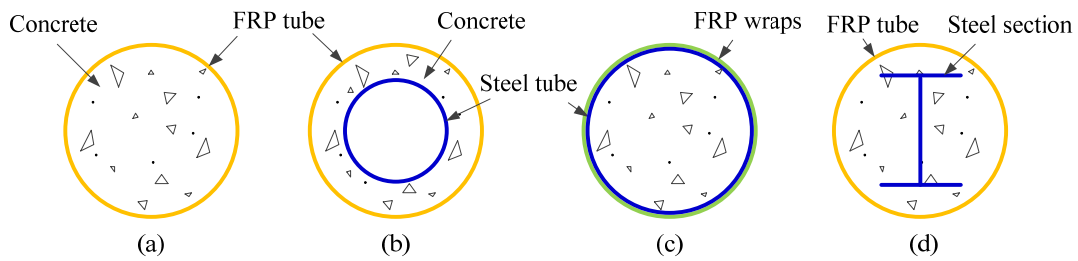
Typical cross-sections of hybrid FRP tubular columns:
